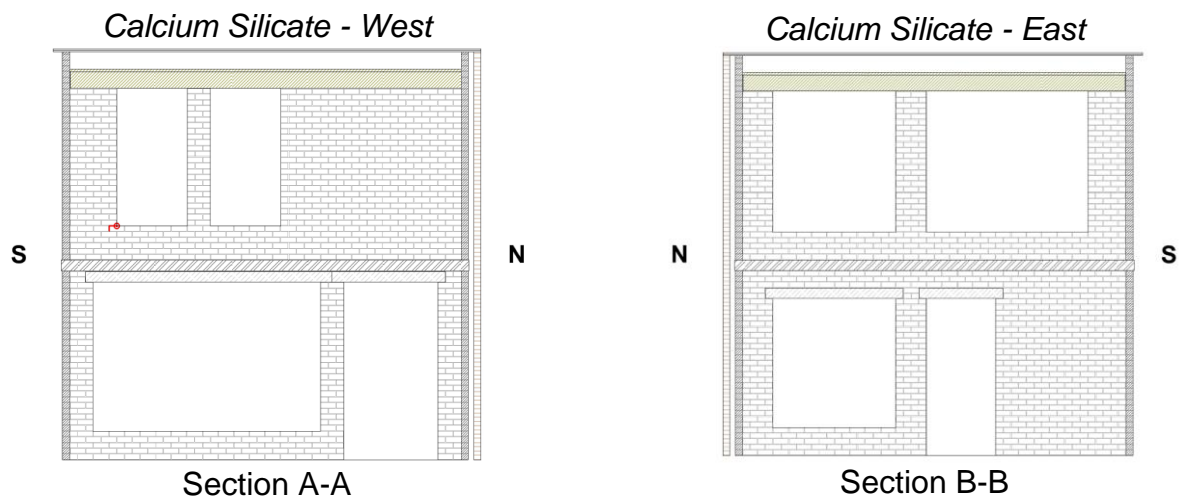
EQ-NPR 20% cracks - Calcium silicate longitudinal walls.
